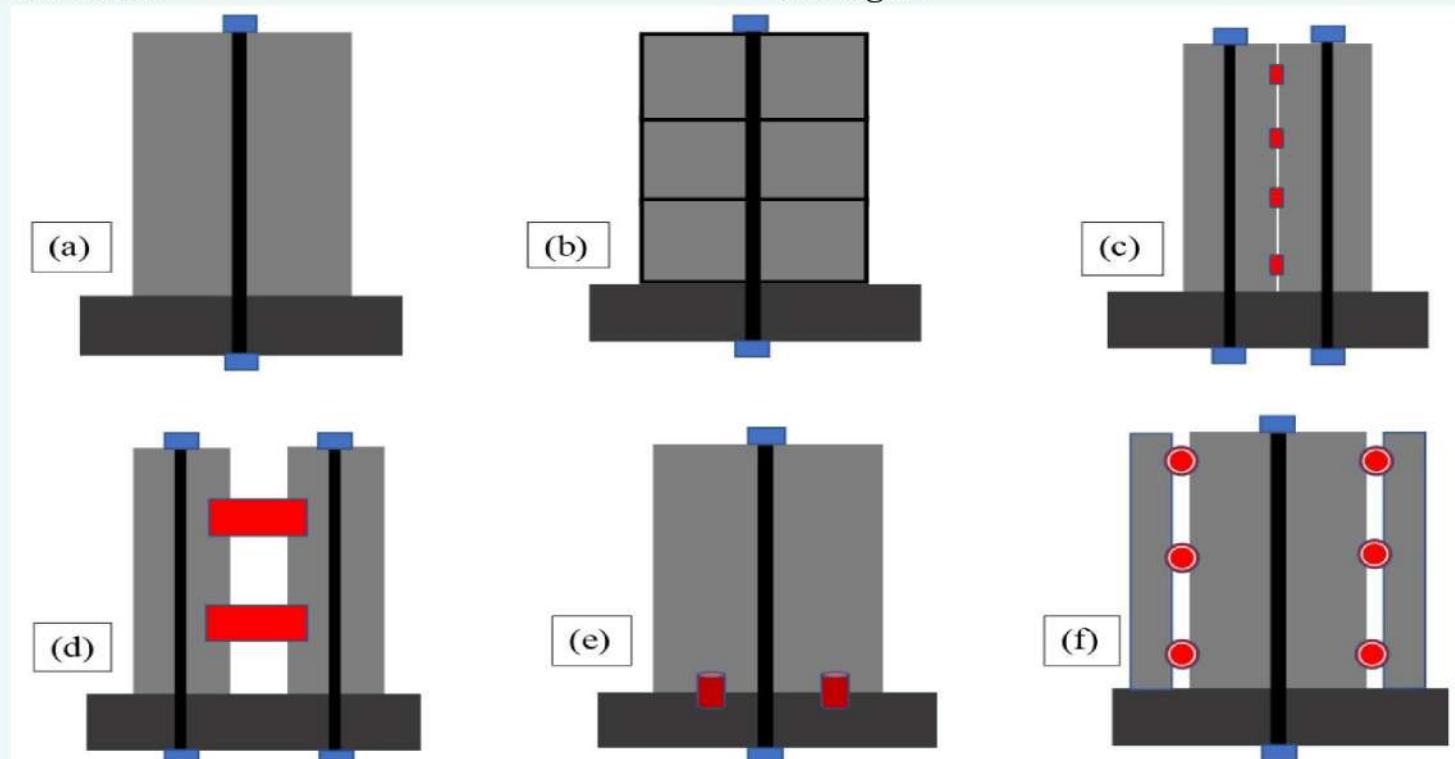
PT shear wall configuration: (a) single panel, (b) multi-panel, (c) jointed, (d) coupled, (e) hybrid, (f) PreWEC walls
